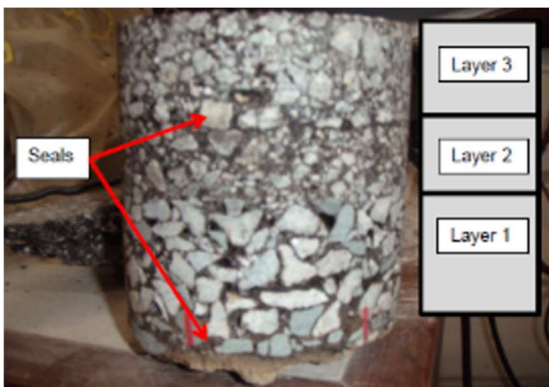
Core from Leach Highway between Stock Road and Carrington Street.
